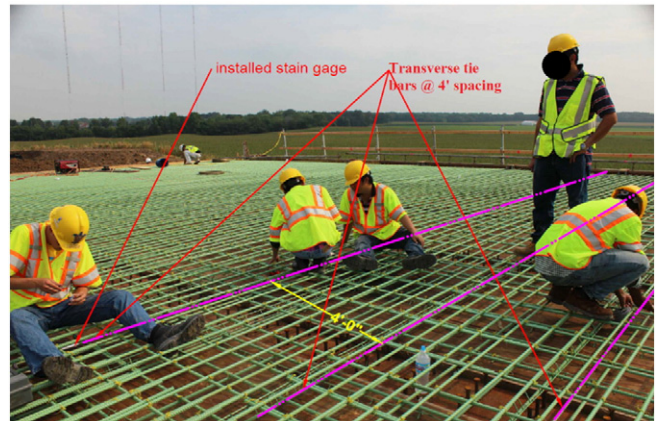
Transverse tie bars placed at 1.22 m (4 ft) spacing.
